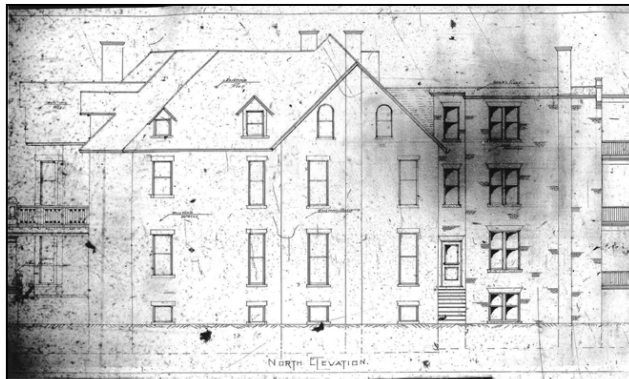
510 Jarvis Street, north elevation, 1919 (Building Records).
